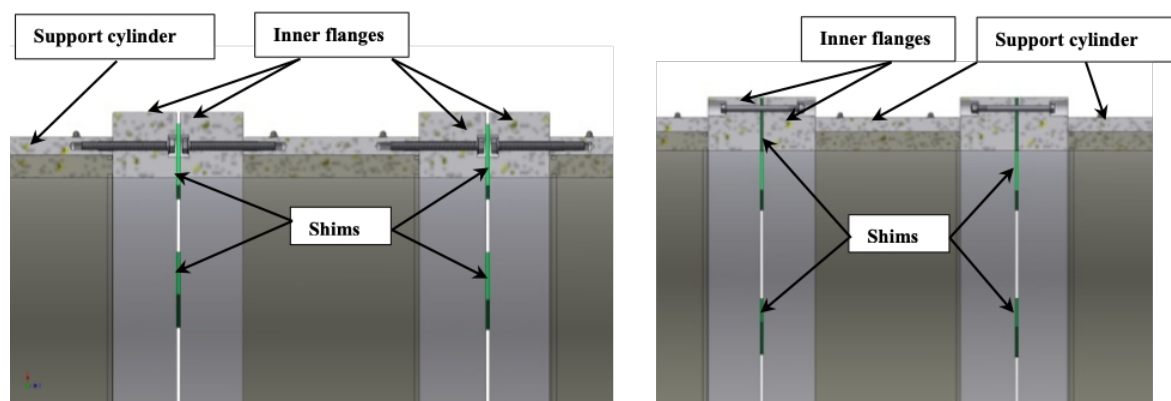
Connections "inner flanges – support cylinder" (left) and "inner flange – inner flange" (right).
